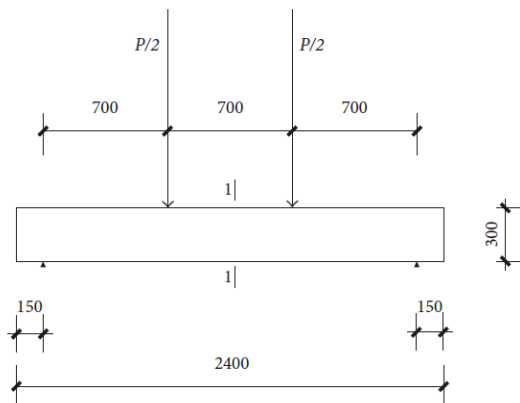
Schematic of the Beam with Boundary Conditions and Loading (Wu & Yuan, 2008).
